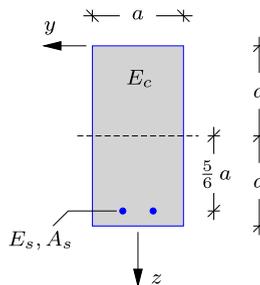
Rectangular cross-section of concrete beam with steel reinforcement.
